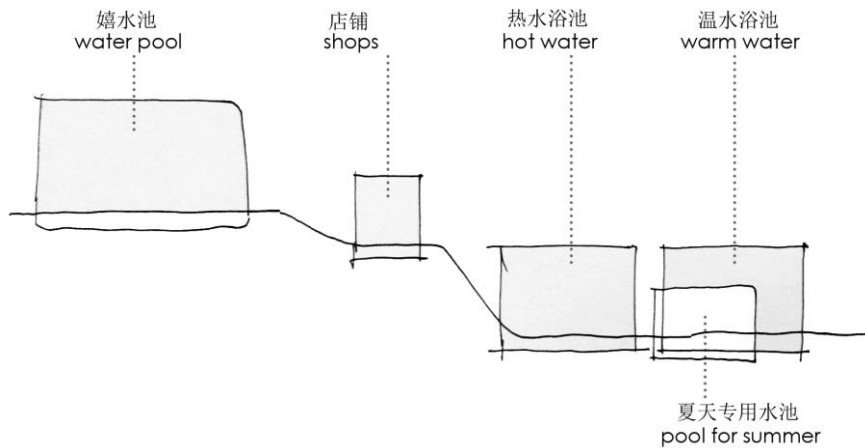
Section layout of Sultan Amir Ahmad Bathhouse
